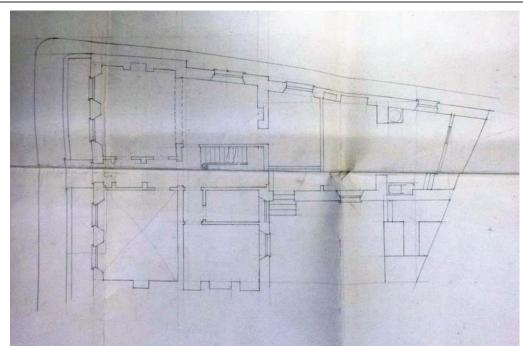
Ground floor plan, undated but probably c1901 (CAC(B) Z/1028/2 1901-1904)
